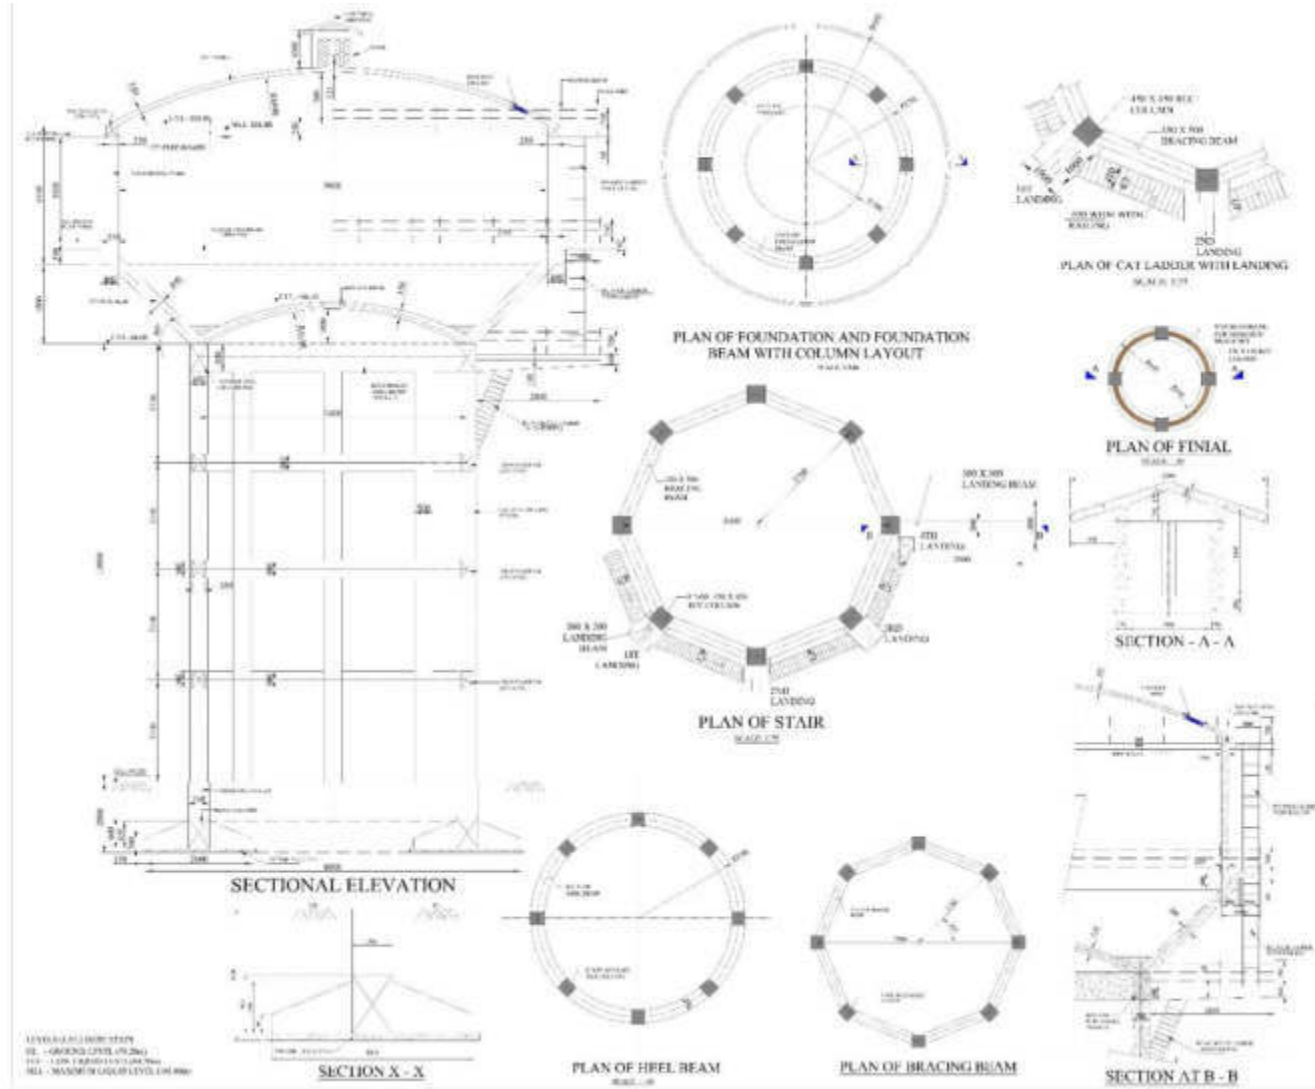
Proposed Layout Plan of OHT at Manipal Zone-6A, Manchi
